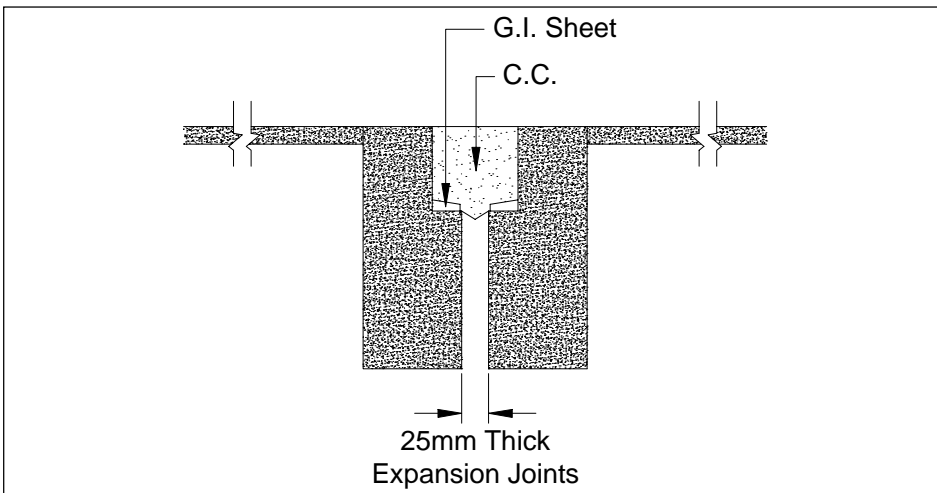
Typical detail of Existing Expansion Joint
